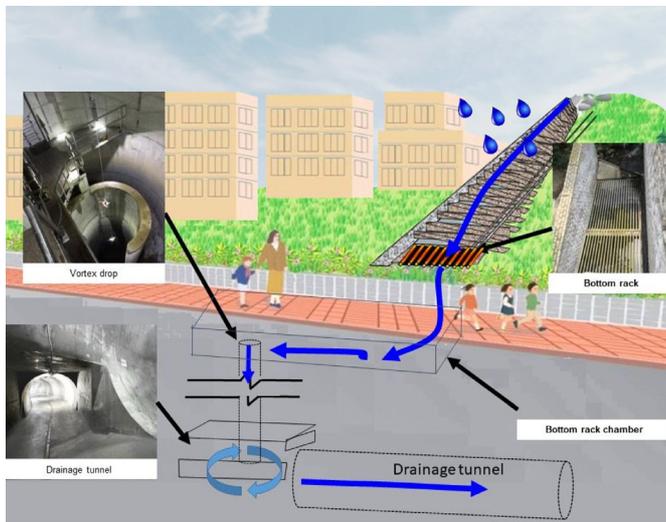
| Design of integrated bottom rack-vortex intake system for stormwater interception (inset: constructed vortex drop and drainage tunnel).
